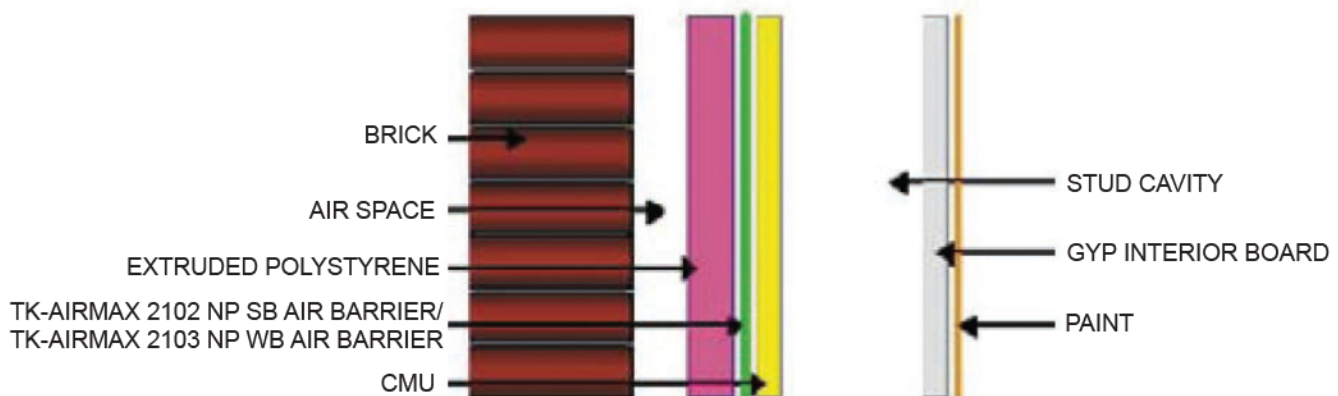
BRICK VENEER W/STUD BACK UP WALL
